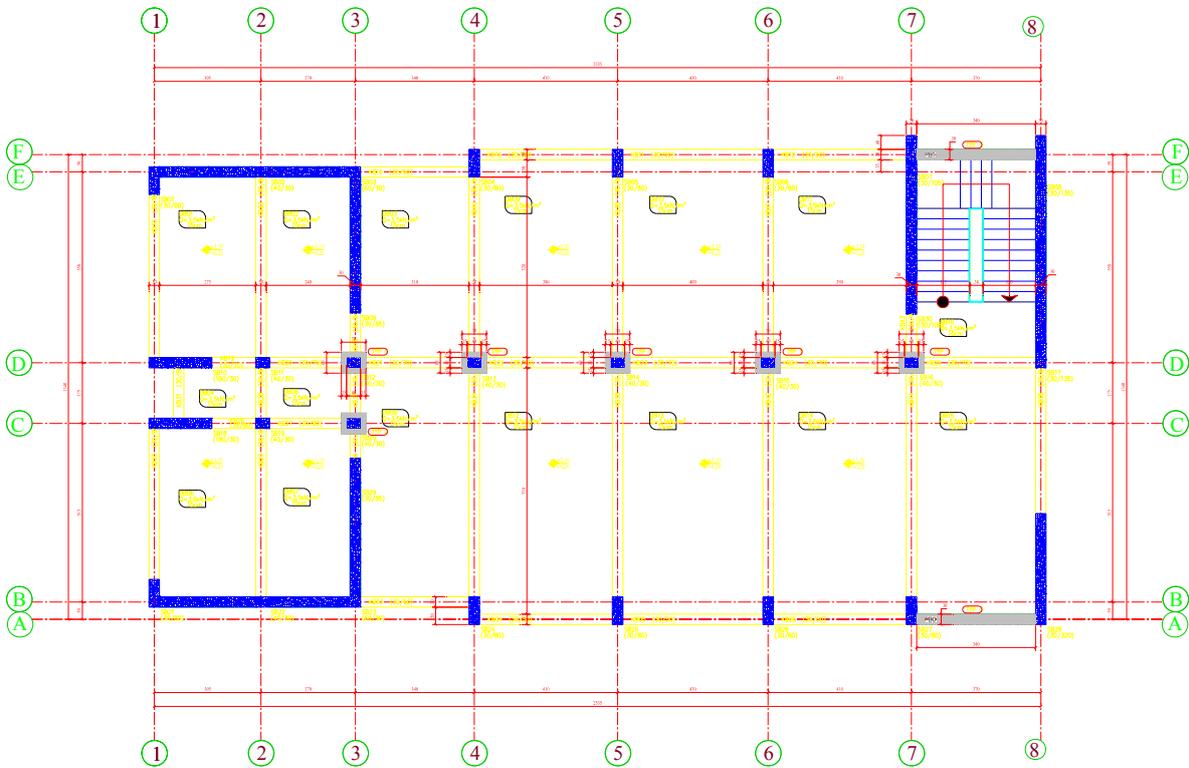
Strengthening of Kazim Karabekir gymnasium hostel A block in Van by adding shear walls and jacking of columns
